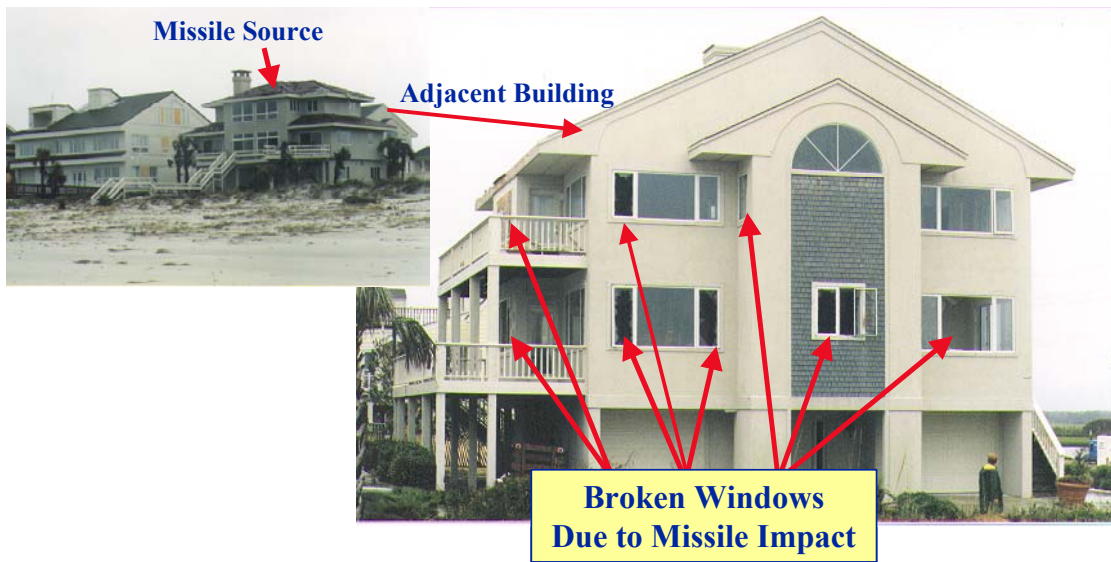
Building Envelope Features that Control Damage and Loss
